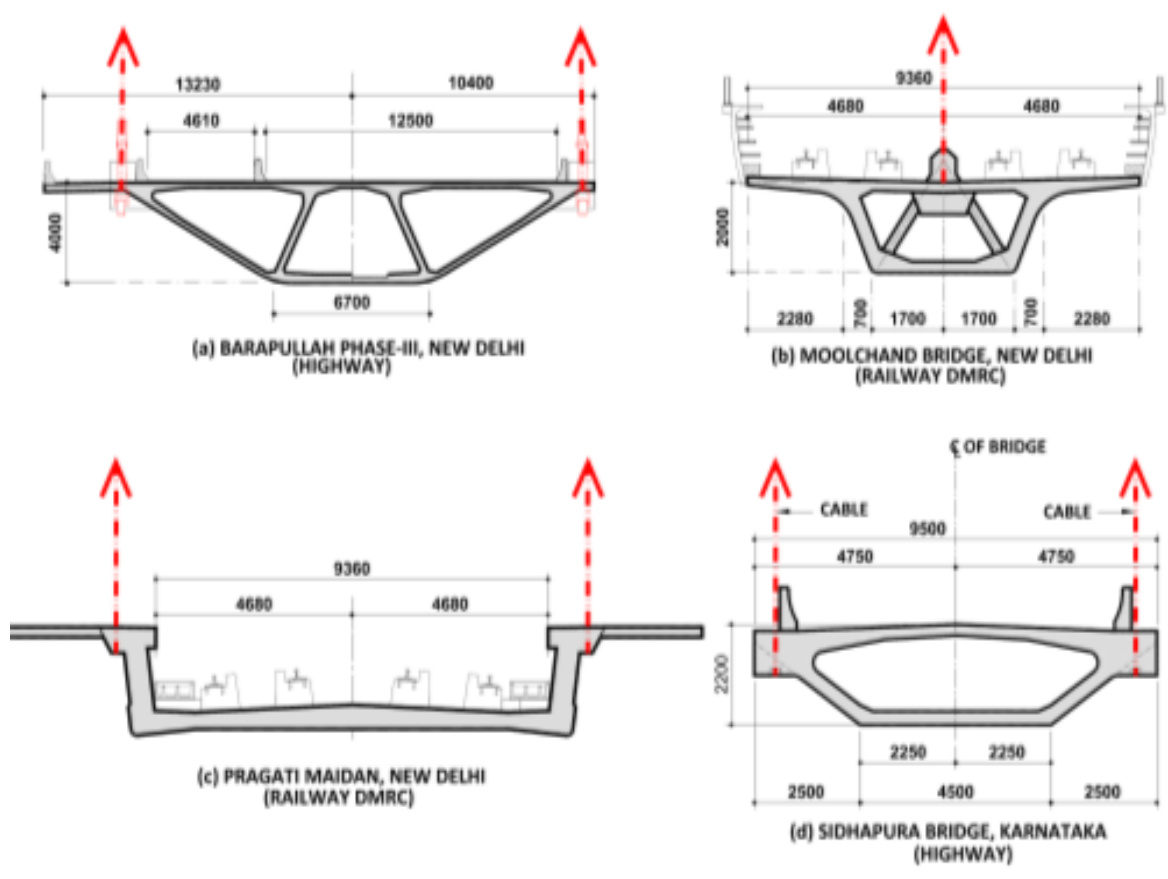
Typical Deck Cross Section for Extradosed Bridges
